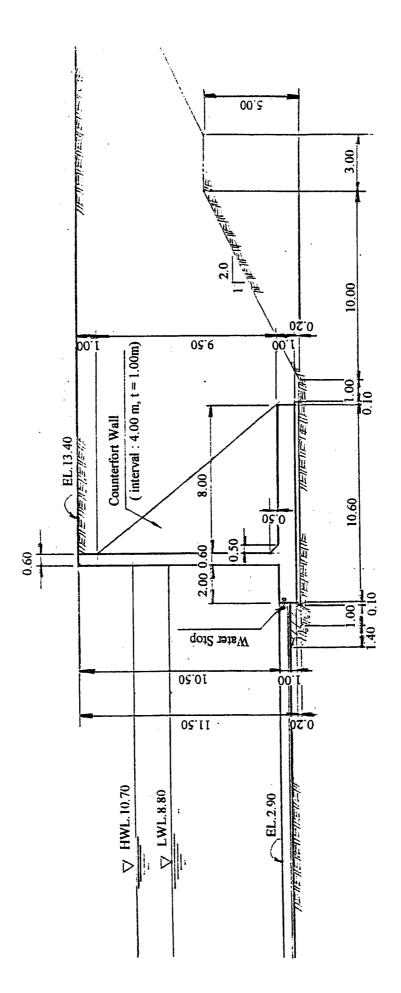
Typical Cross Section of Counterfort Wall Type
